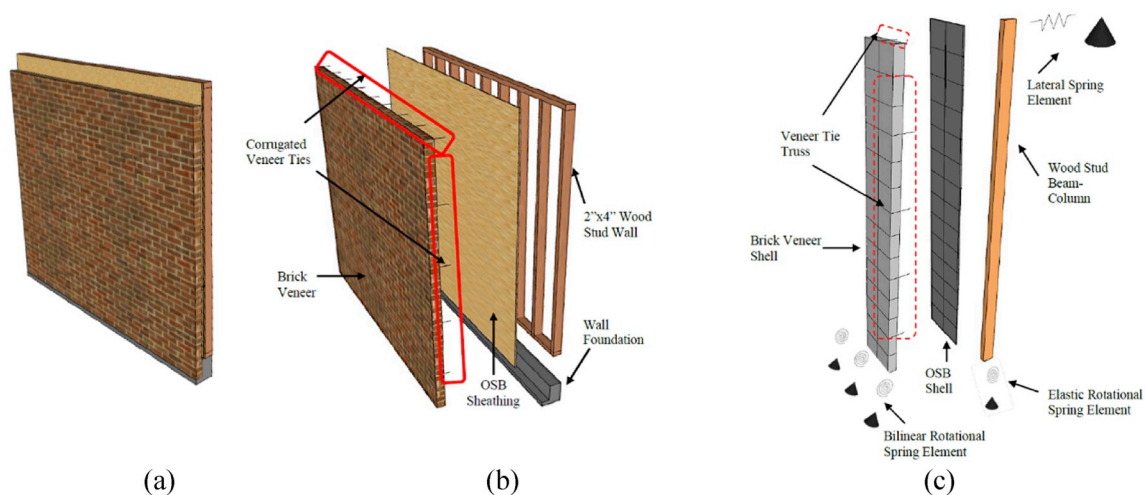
Renderings of brick veneer wall: (a) Actual wall panel as constructed, (b) Actual wall with individual elements labeled, (c) Schematic view of veneer strip model developed in OpenSees.
